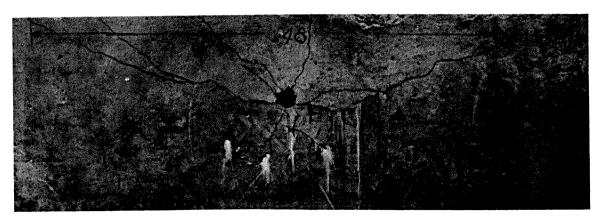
Typical spalling caused by overloading a form anchor
